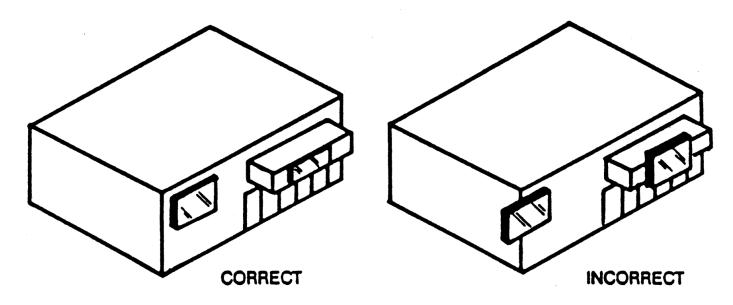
A Building Sign Shall Not Extend Beyond Any Edge of the Surface to Which it is Attached
